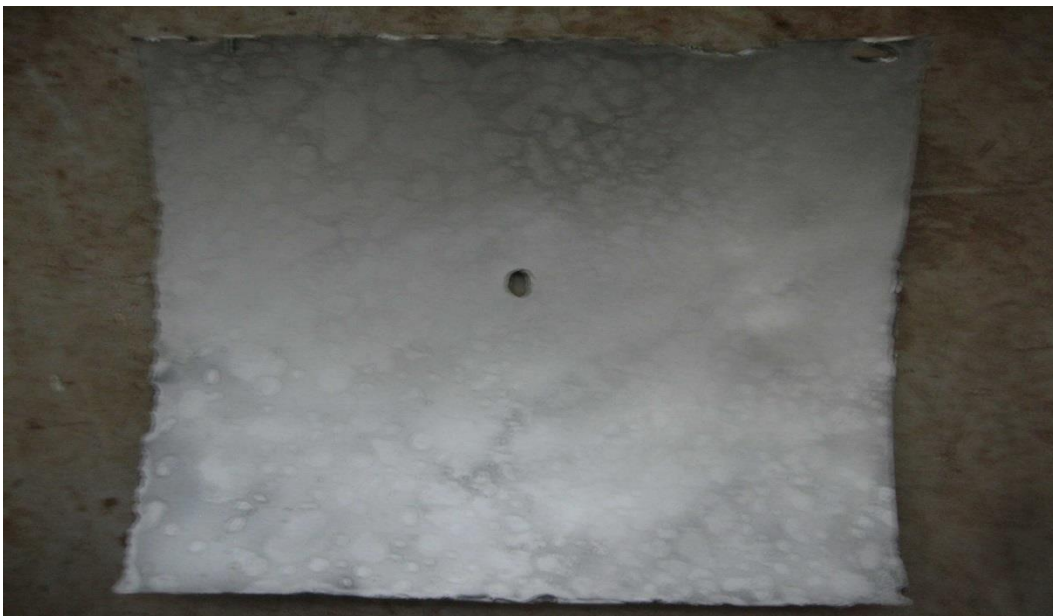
An example of a straight pipe in a 700-mm diameter steel WTM after sandblasting for pipe cleaning, in which a big hole due to corrosion went through a pipe wall, causing a pipe break
